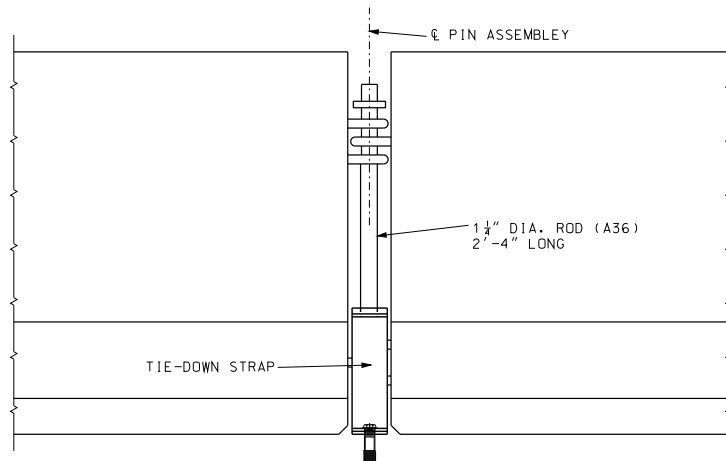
DETAILS OF TYPE F TEMPORARY BARRIER TIE-DOWN STRAP
